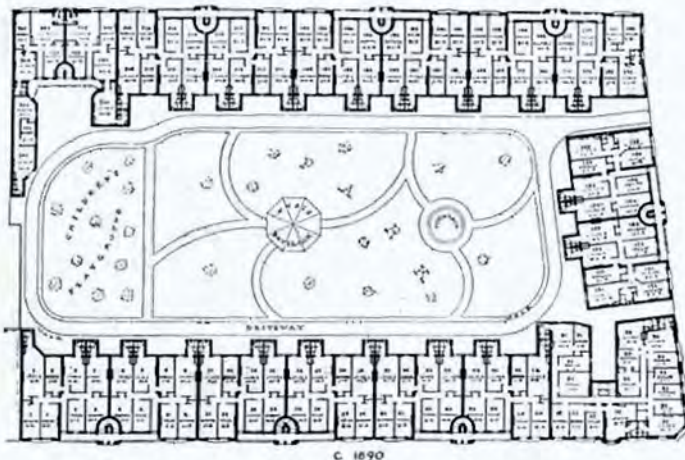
Riverside Buildings. William L. Field & Son. 1890. Plan of typical floor, almost identical to plan of Home and Tower Buildings.
